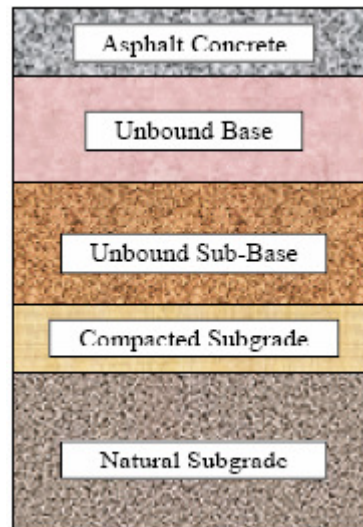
Illustration of possible conventional flexible pavement layered system [4]
